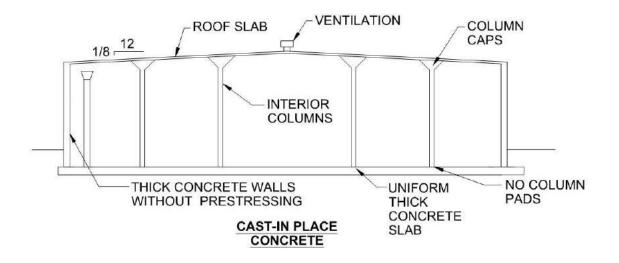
Cross section of a Cast-in Place Conventionally Reinforced Concrete Tank
